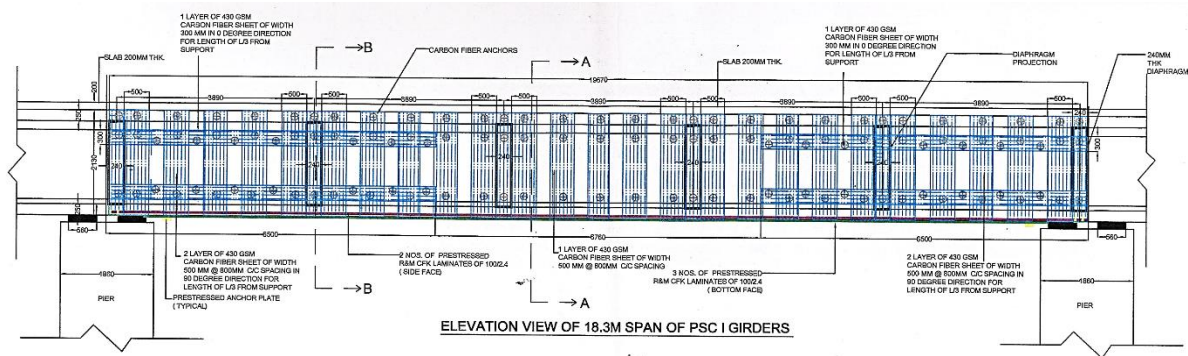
Elevation view of 18.3m span of Ratlam Railway Bridge PSC I girders.
